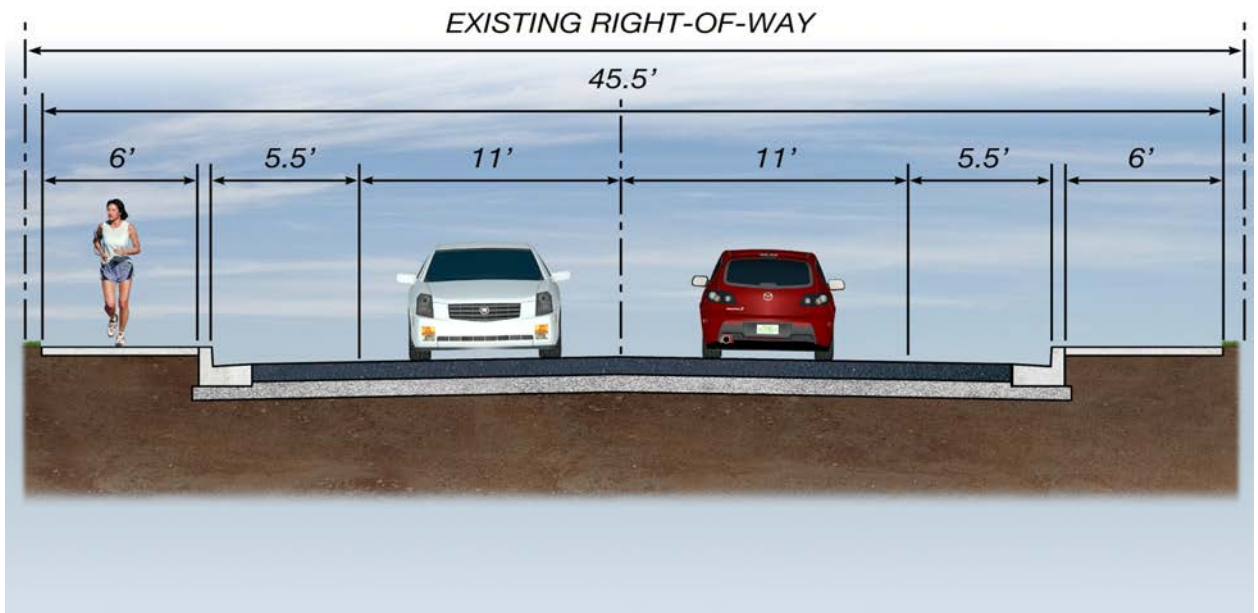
Proposed Roadway Section East of Proposed Movable Bridge
